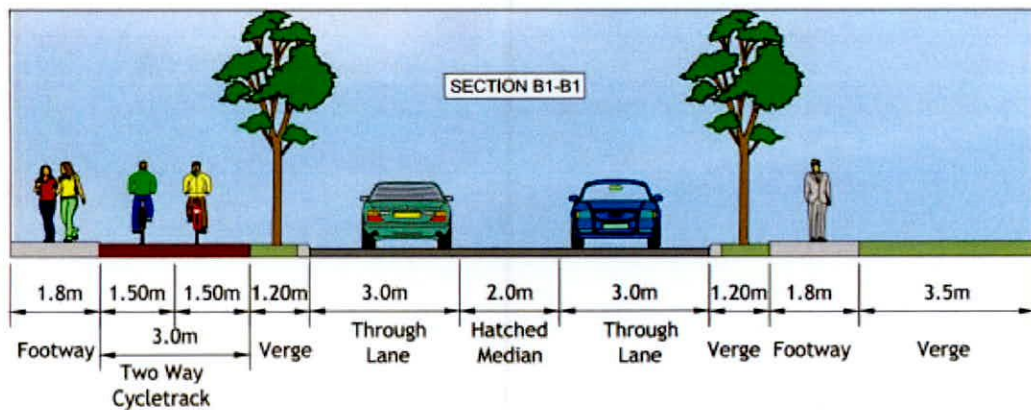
Street Geometry : Warehouse / Logistics East-West Aligned Access Road
